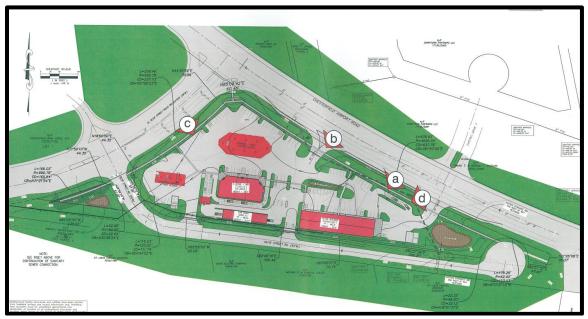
Colored Site Plan (letters represent cross section details not shown)
